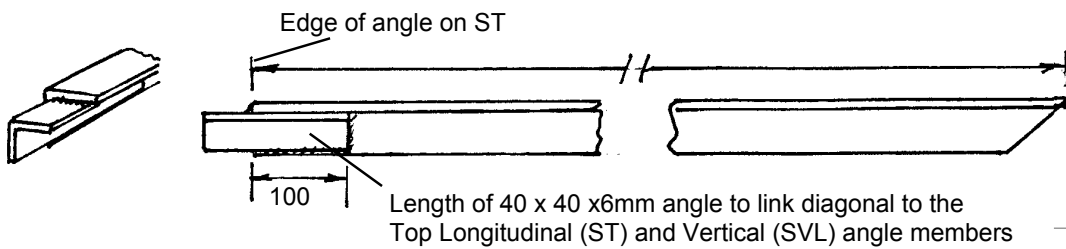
(Sheet 3): Manufacture of members for Side Panels
